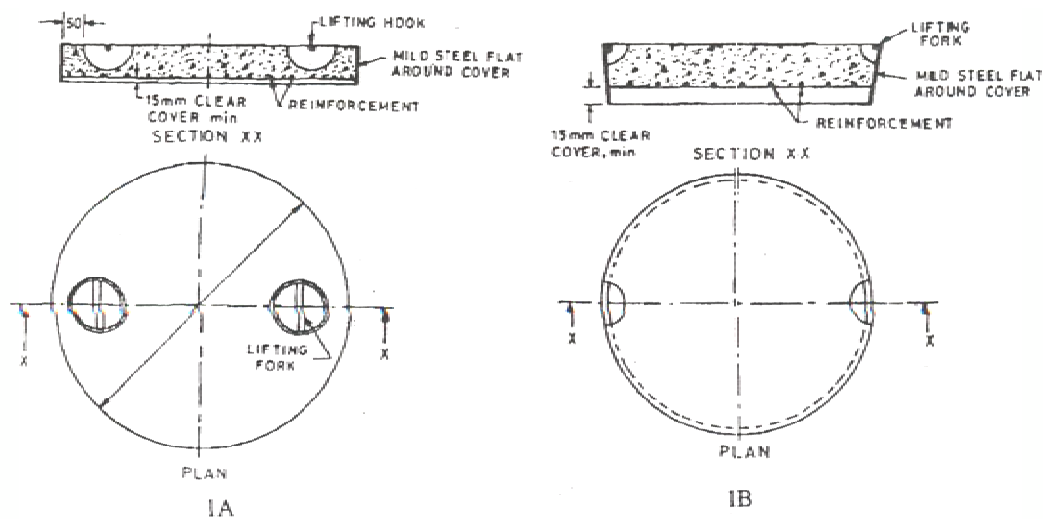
Typical Illustration of Circular Precast Concrete Manhole Cover
